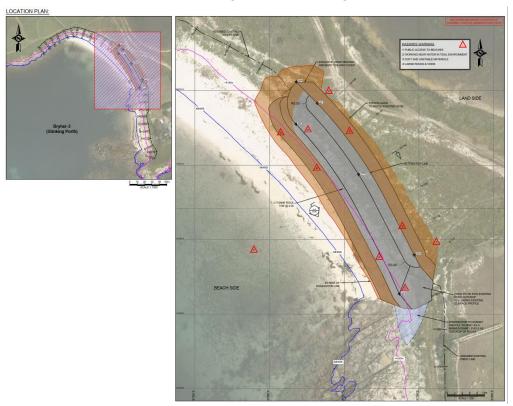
Extent of proposed new revetment at Stinking Porth (HR Wallingford 2022)
